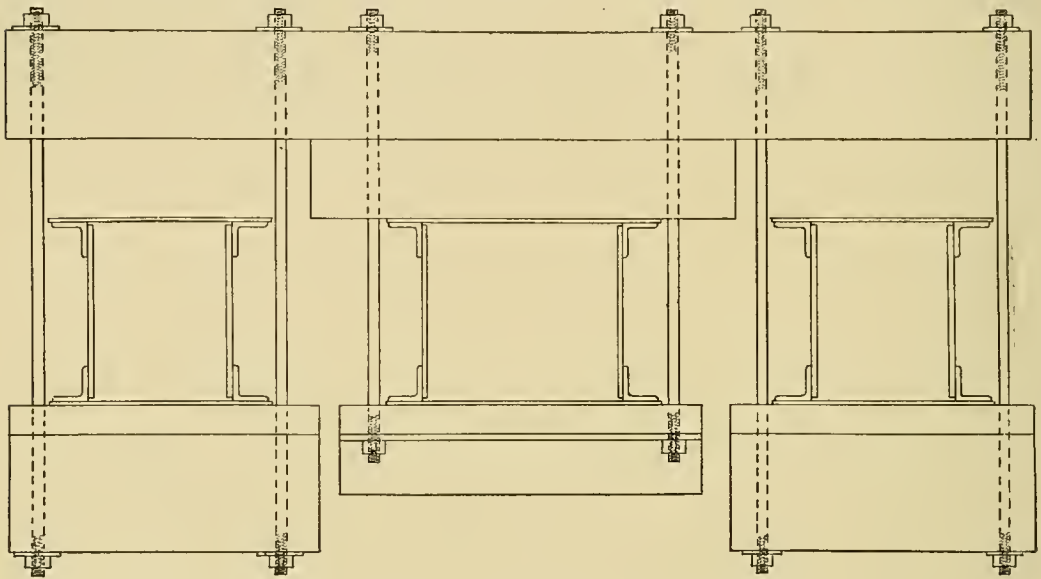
METHOD OF TEMPORARILY SUPPORTING TOP CHORDS OF ORIGINAL TRUSSES UPON TOP CHORD OF RAILWAY TRUSS.
